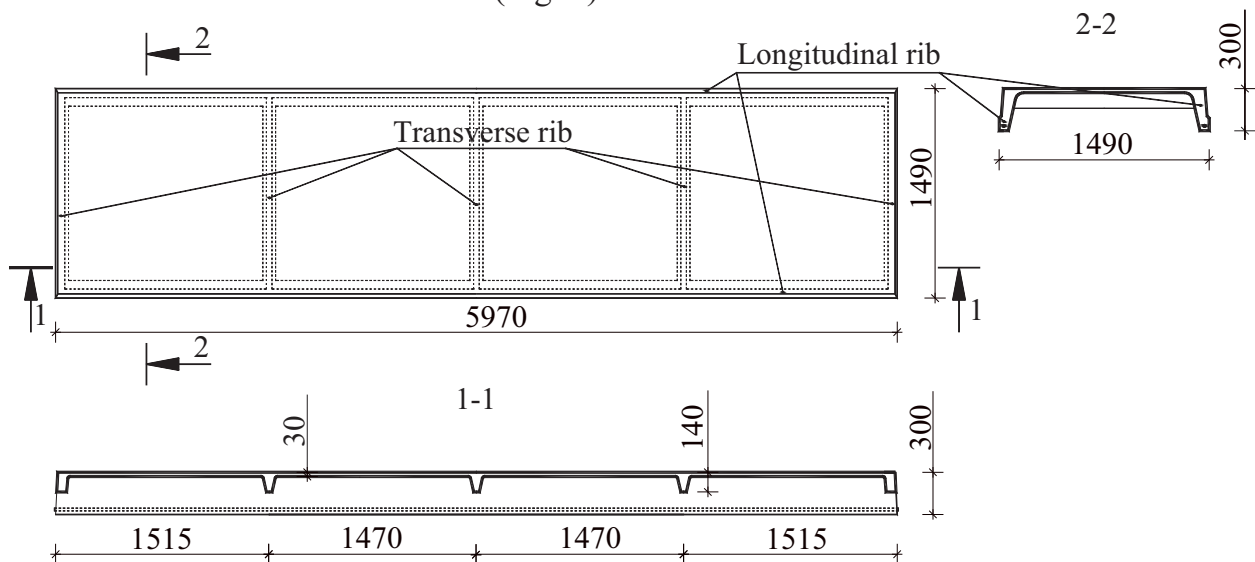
Top view, longitudinal and transversal section of a precast ribbed panel
